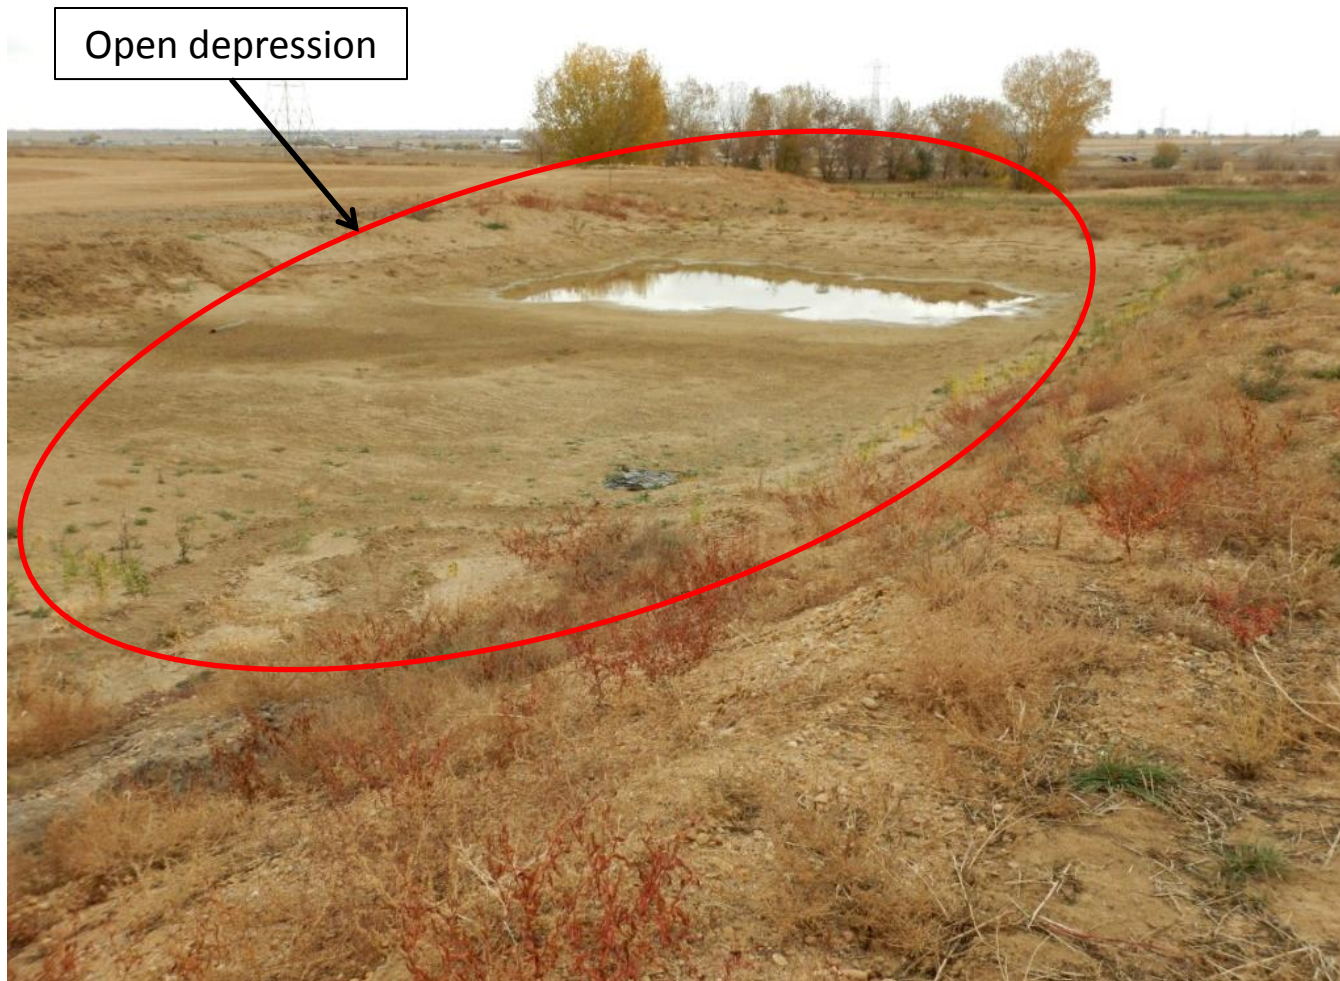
Photo taken from southeast location, facing East. Open depression needs to be reclaimed and contoured back to the reference cropland landscape.
